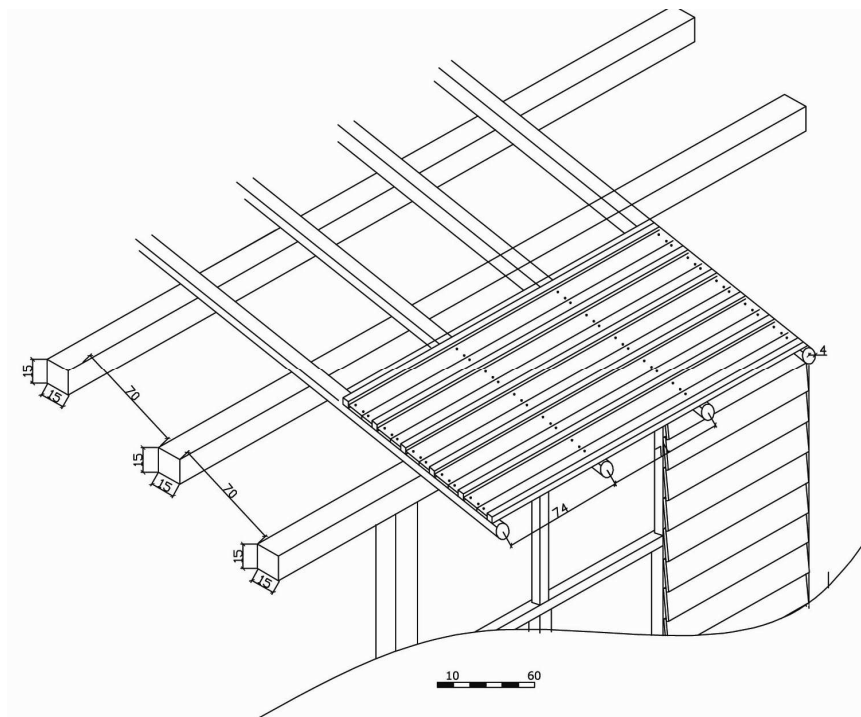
45 Axonometric view of the roof. Çelik 2008.
